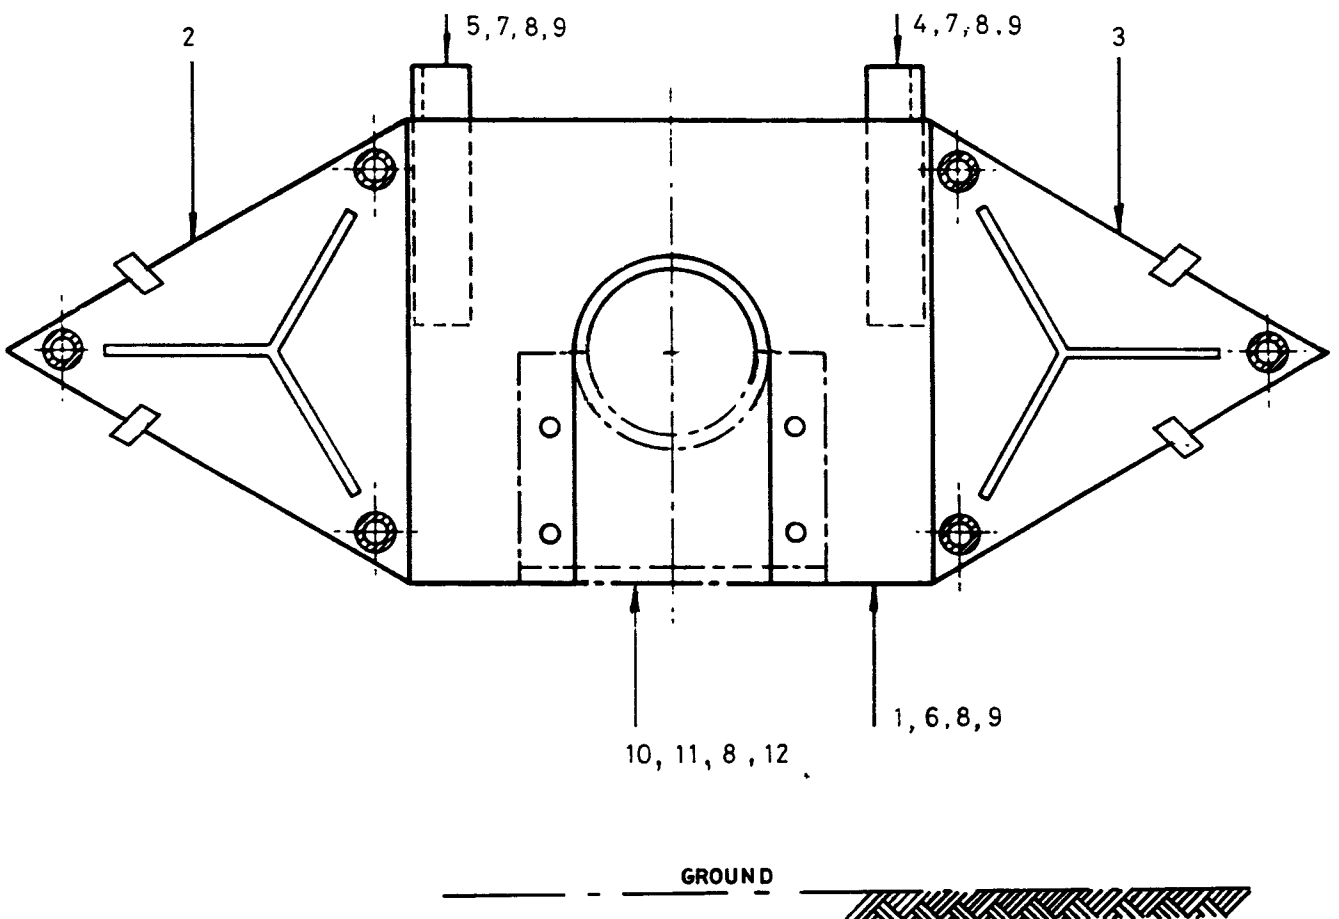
Intermediate guy attachment and bearing assembly viewed from top of twin lattice mast.
